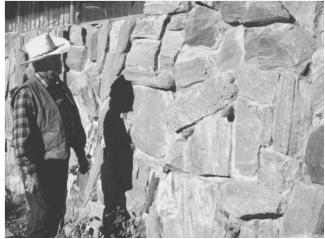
Precambrian Vadito schist used as veneer wainscoting in Santa Fe, New Mexico
